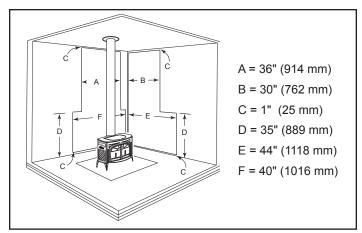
Parallel installation, vertical chimney connector, two wall shields. Reduced clearances for both rear and side walls. Wall shields may meet at corner if desired. Shielding for connector is centered behind connector.
